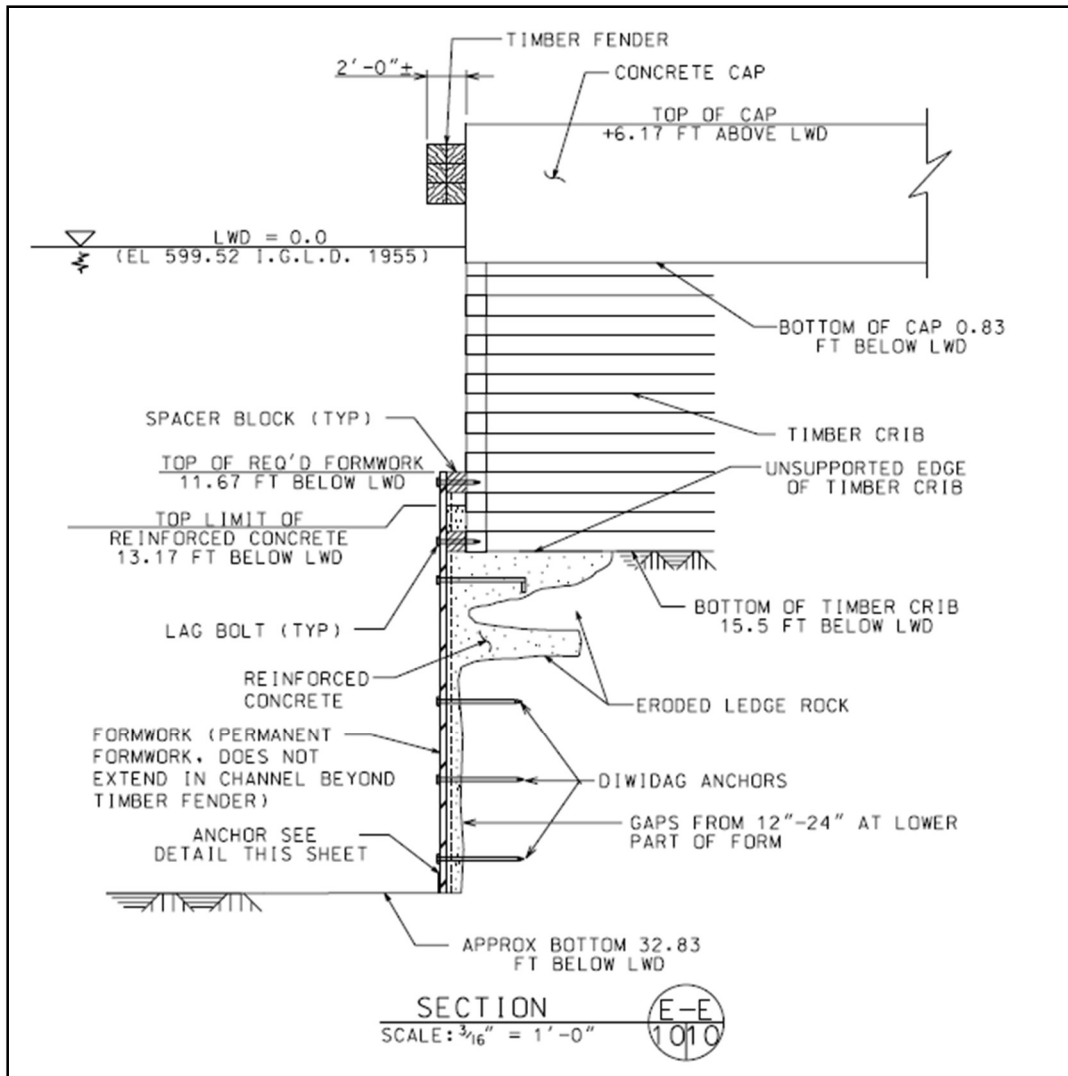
1994 Repair Drawings – Section Through Crib (2020 Strike Location)
